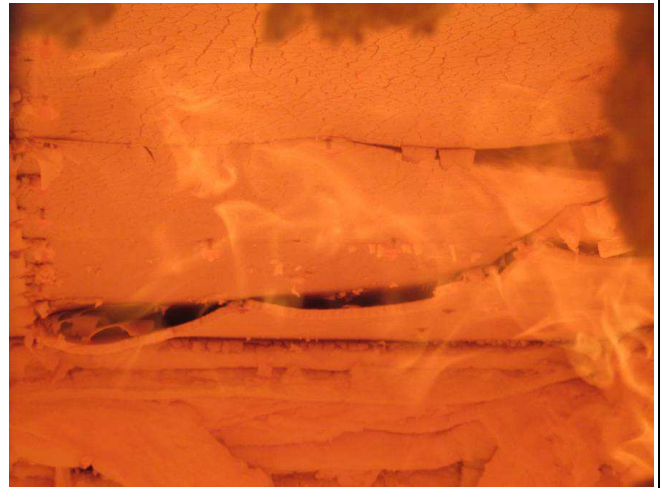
The exposed surface of the specimen after test duration of 74 minutes, showing part of second layer plasterboard ceiling was falling into the furnace
